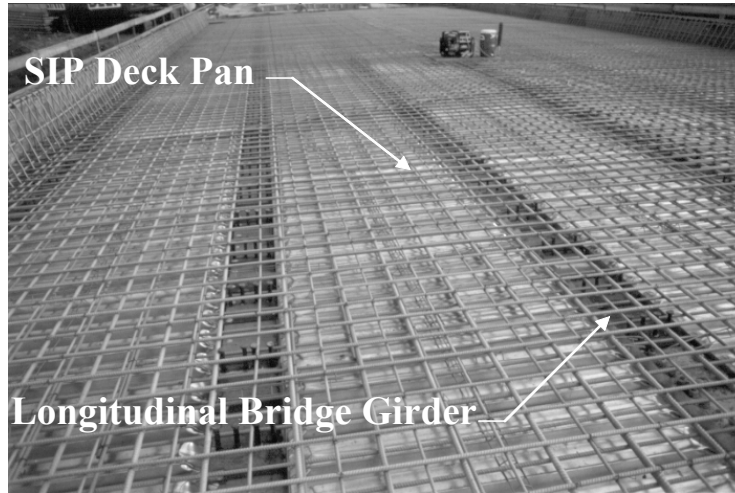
SIP Deck Pans Placed Between Girders (I65 over SR25)
